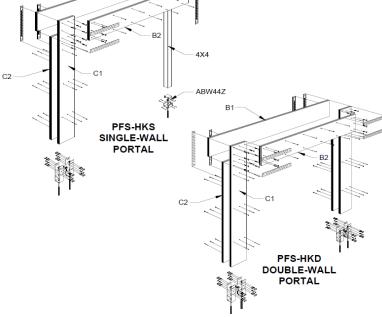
LVL PORTAL FRAME ASSEMBLY
